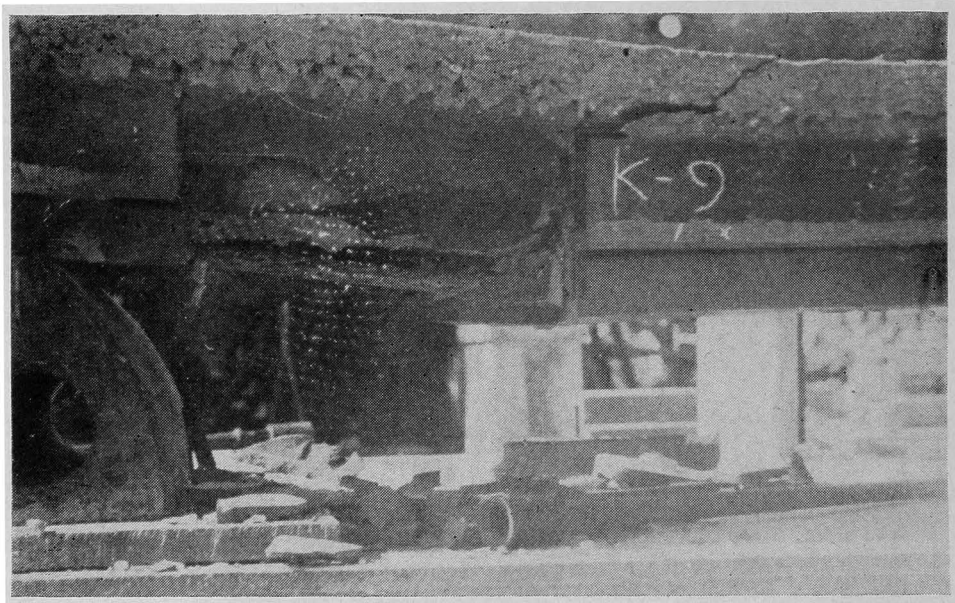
(a). Typical failure of heavy type beams made from Tile C. Note that here there was no bond failure between tile and concrete as was the case of joistile beams using this same tile.
